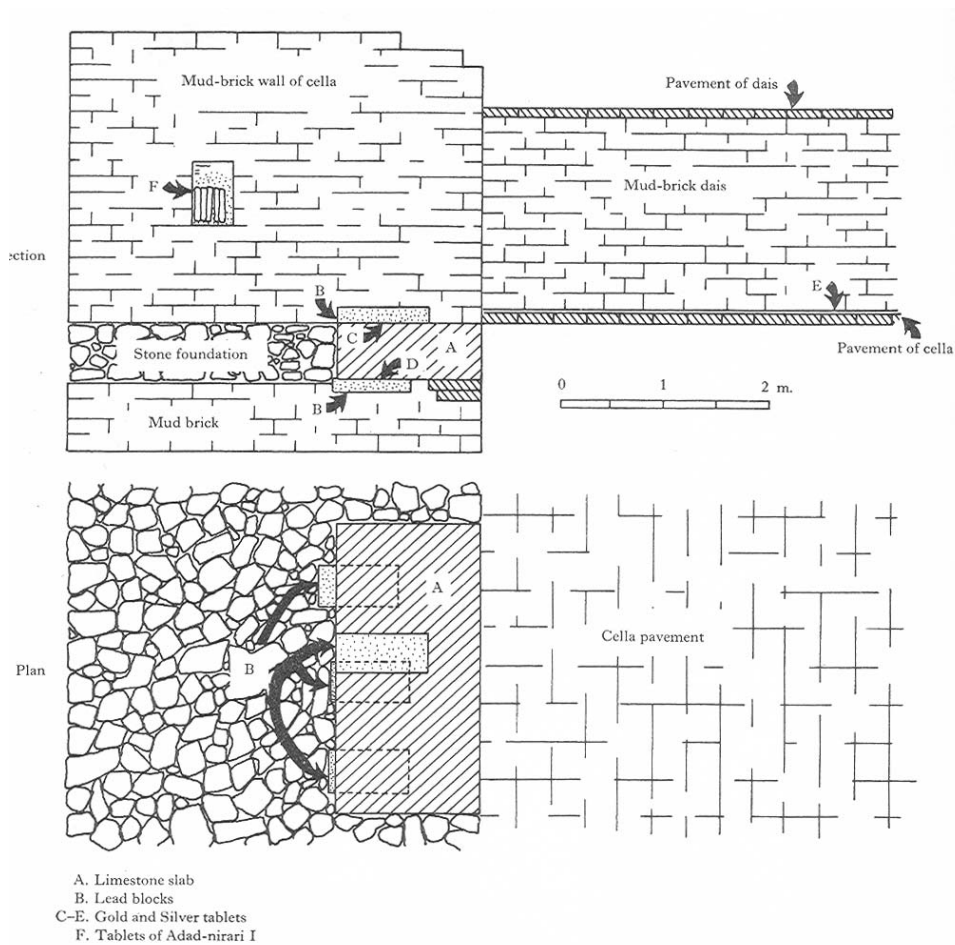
Section and plan of deposits in the temple of Istar Aššuritū at Assur (Ellis 1968)
